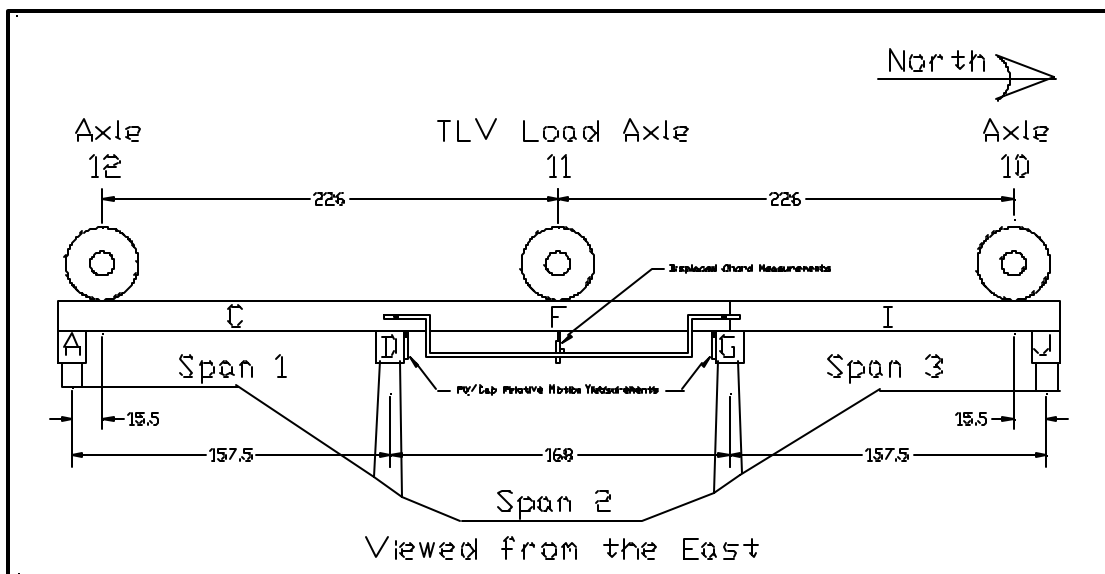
Load positioning on Bridge 101 for 11@F. Dimensions are in inches.
